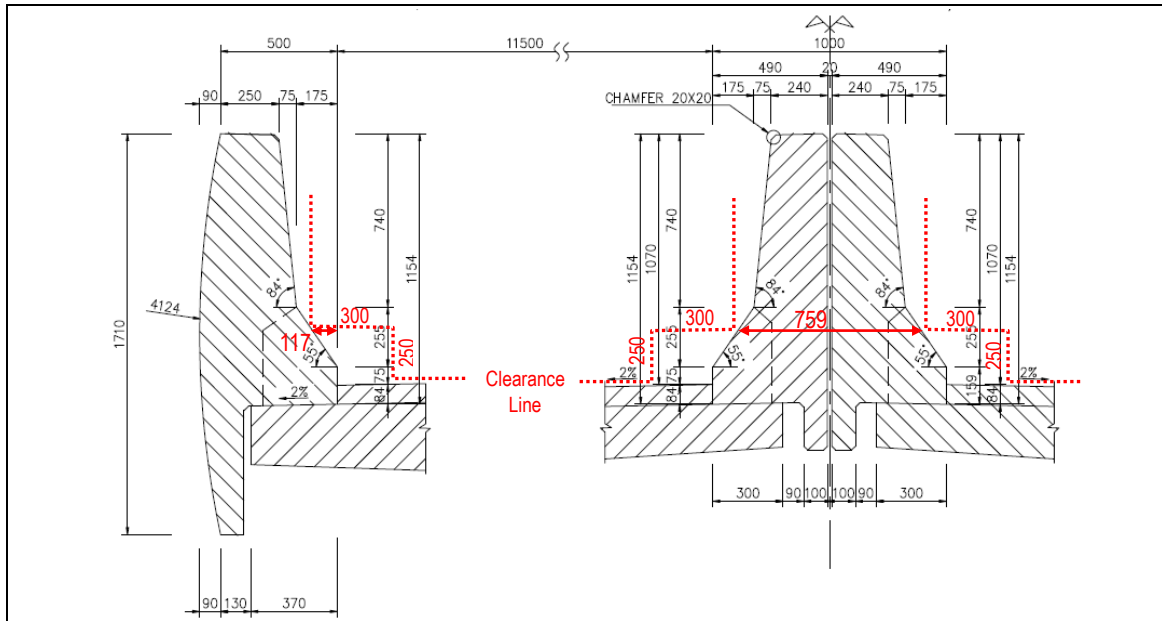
New Jersey Barrier (TL-5 for Bridge Section)
